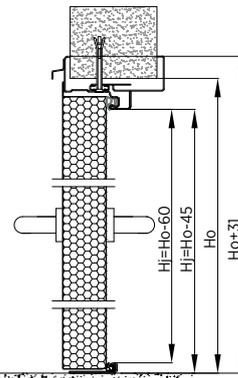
Installation of the single-leaf door to a masonry wall - wrap-around frame with a thermal break - vertical cross-section
